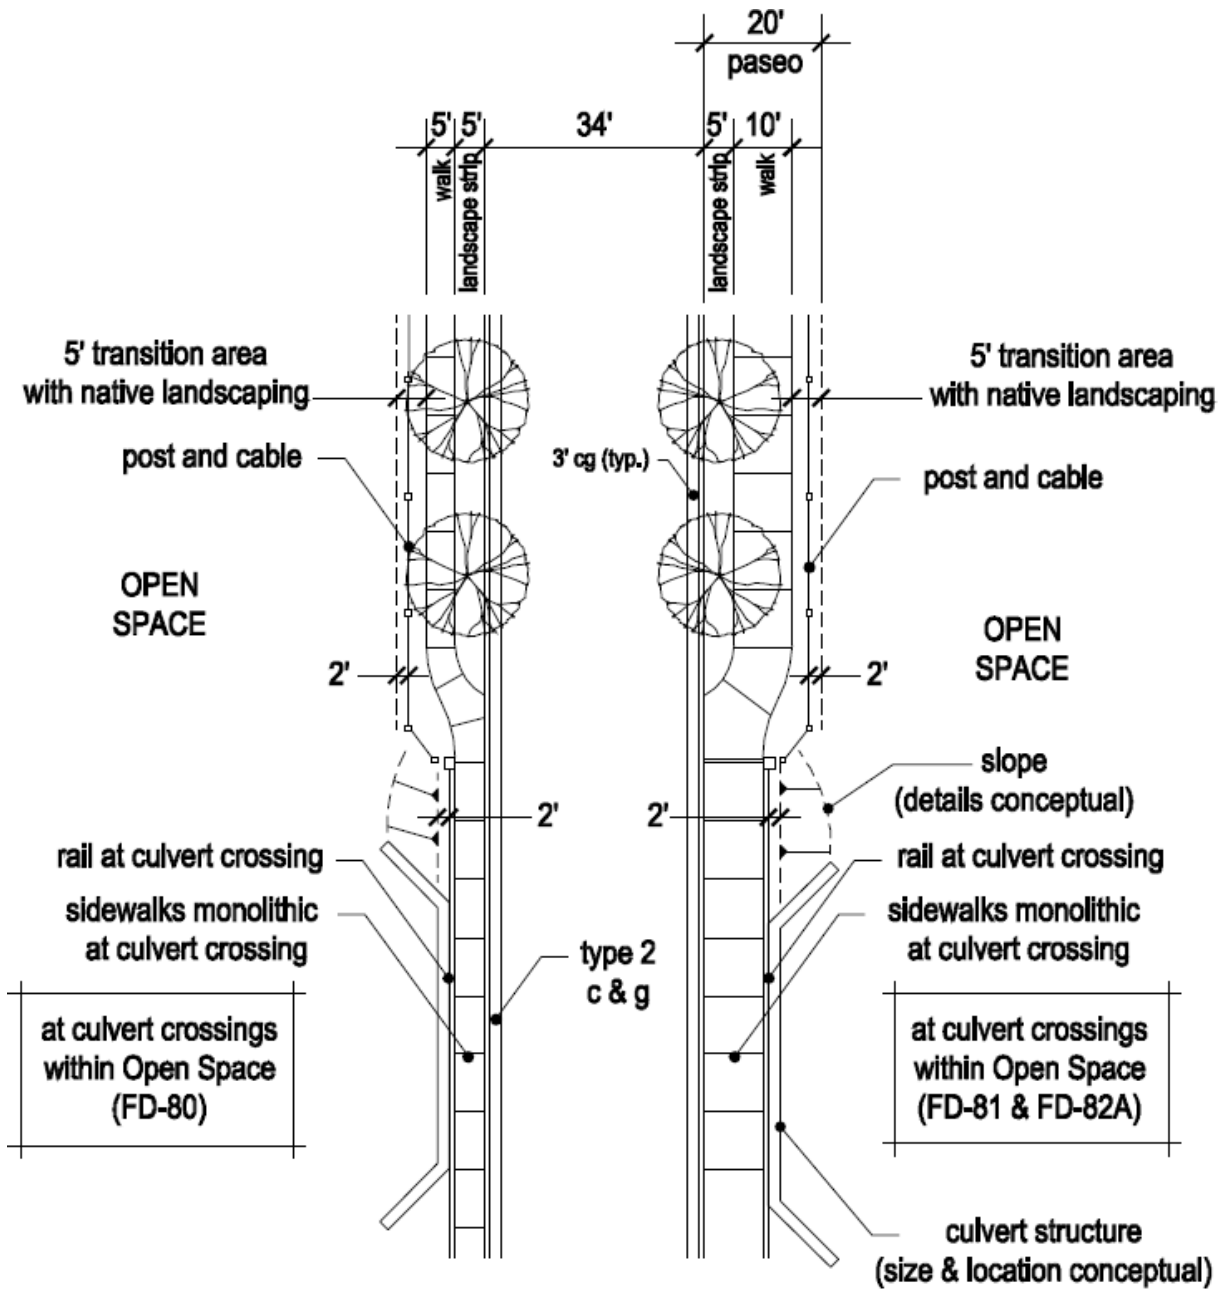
Primary Residential Street Paseo (at Open Space and at culvert crossing)
